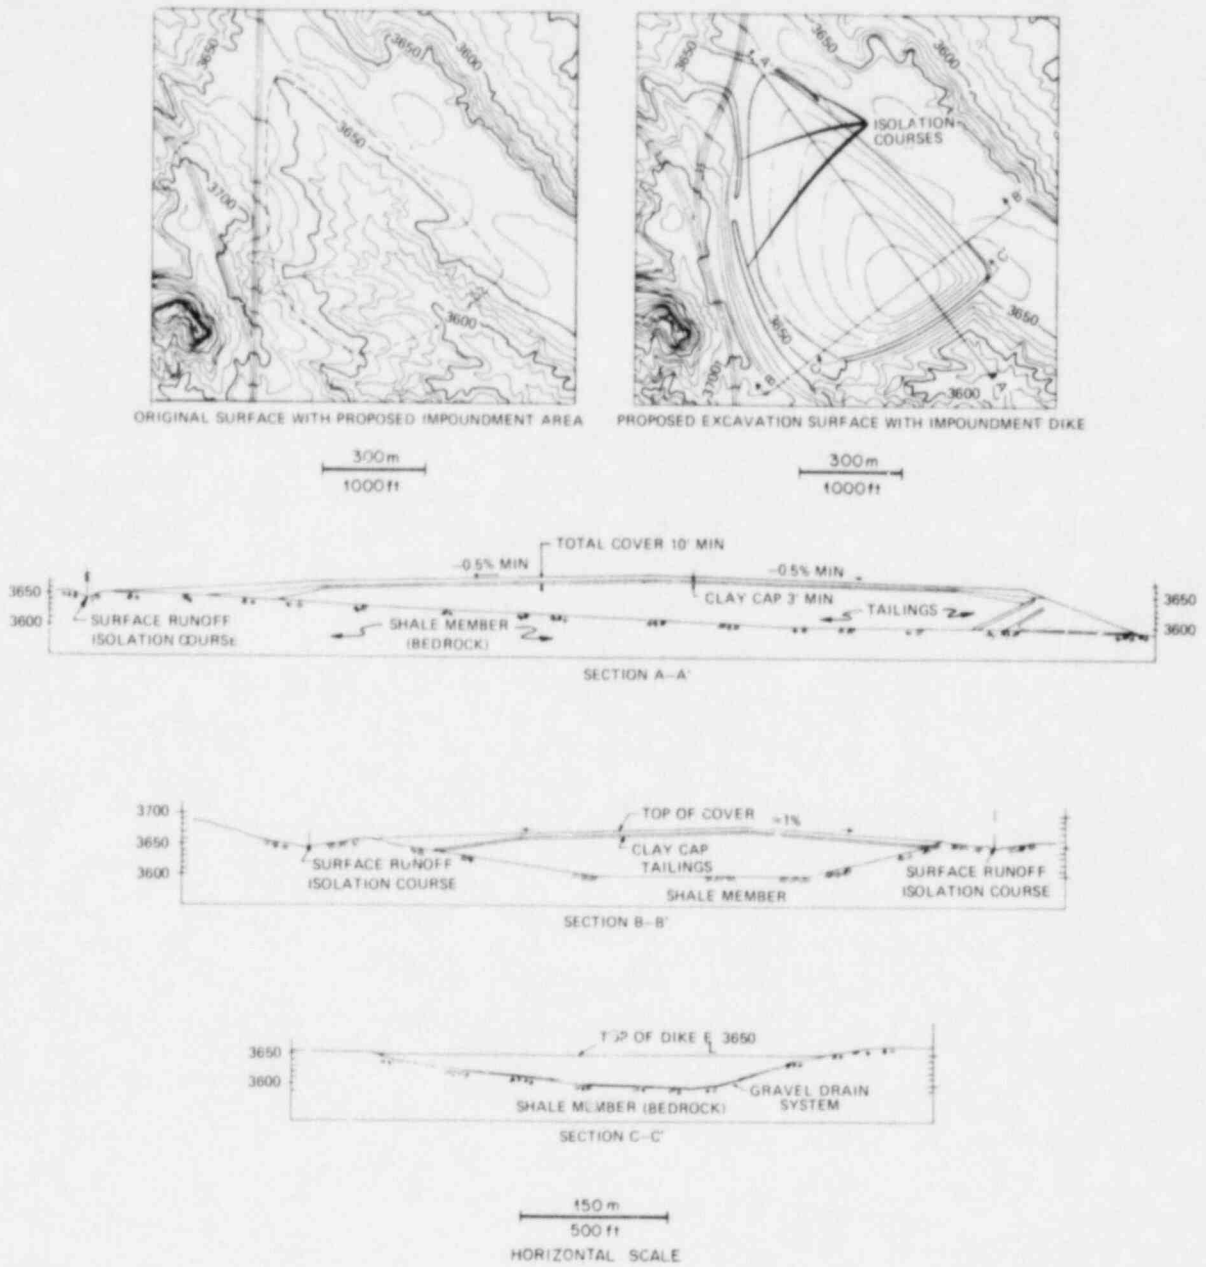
Details of proposed Edgemont disposal site tailings impoundment area. Source: adapted from ER, rev. 3, Fig. 3.3-3.
